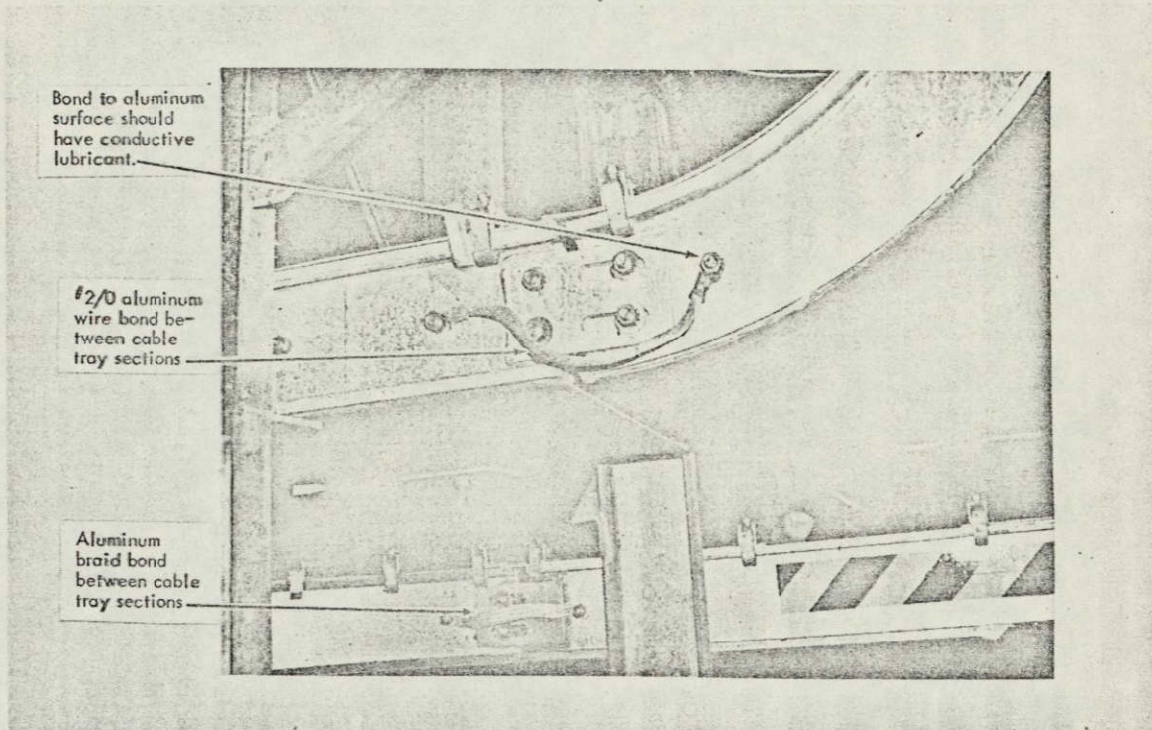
LUT-2, 240-Foot Level - Typical Cable Tray Bonding
